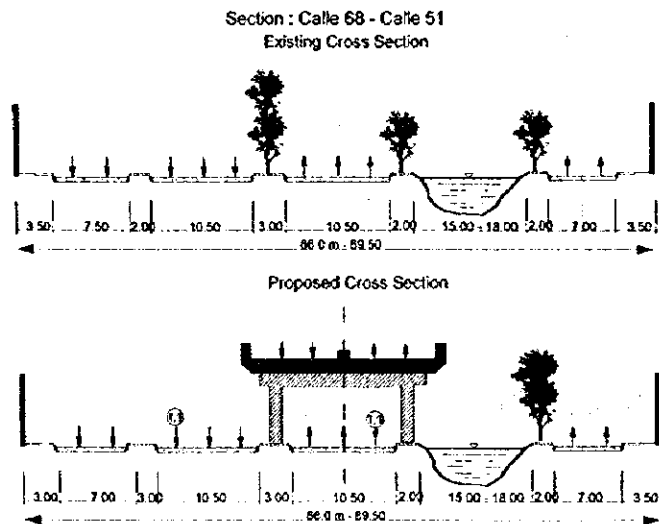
Typical Cross Section on Avenida Quito (3)
